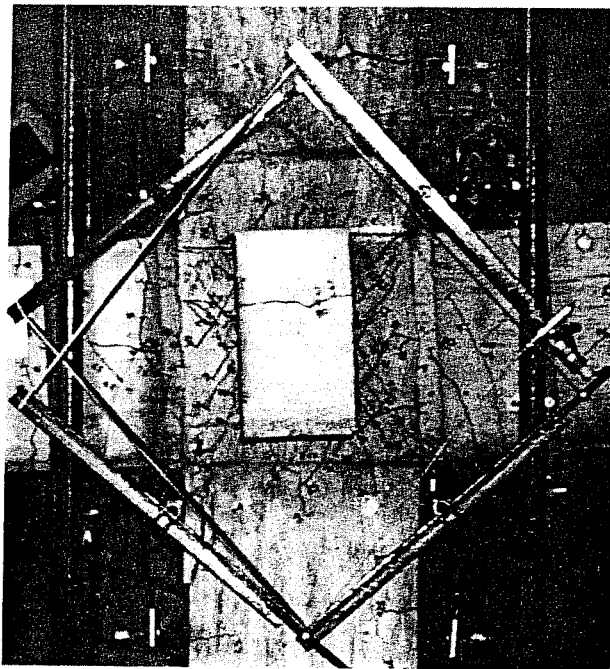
Orientation of joint shear cracks in Specimen IX
